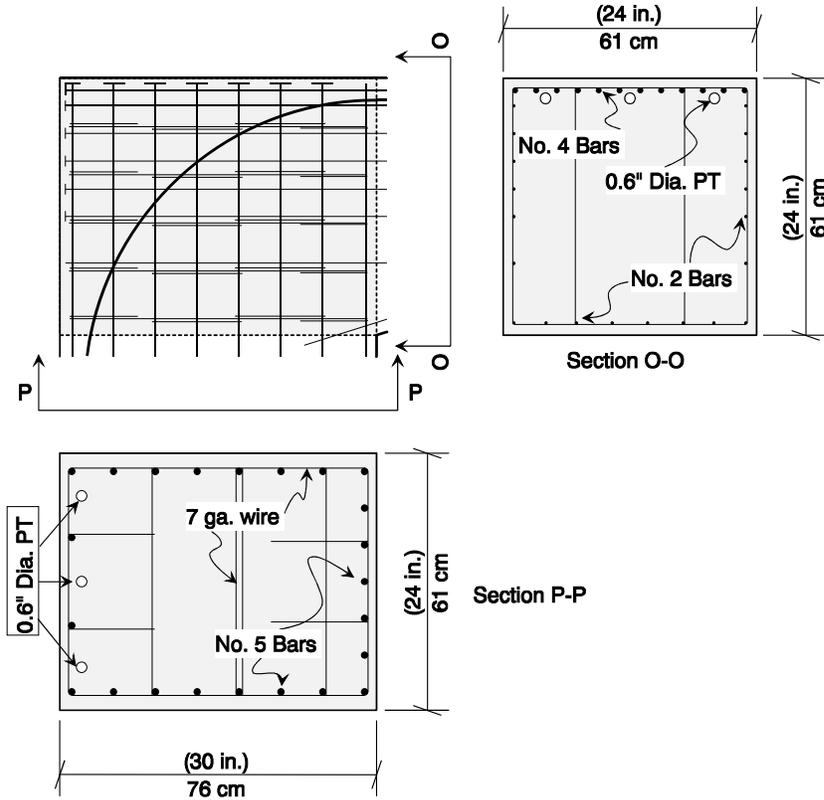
POJ-PU-54-TH joint reinforcement details
